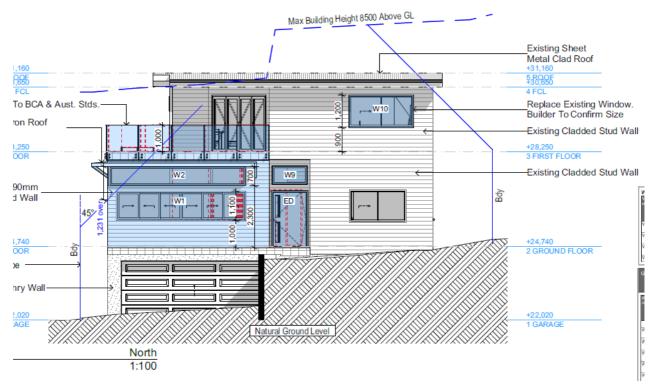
Northern elevation with ground floor encroaching the side boundary envelope (original plans)
